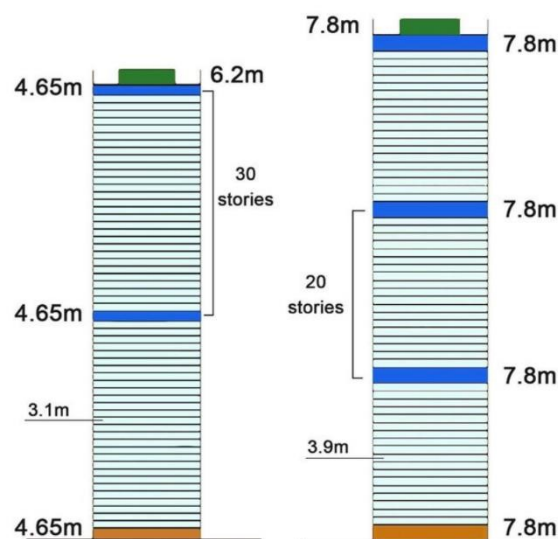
(Left) 60 storey residential building (206.15 m); (Right) 60 storey office building (273m) (Source: Saroglou *et al.*, 2017)
